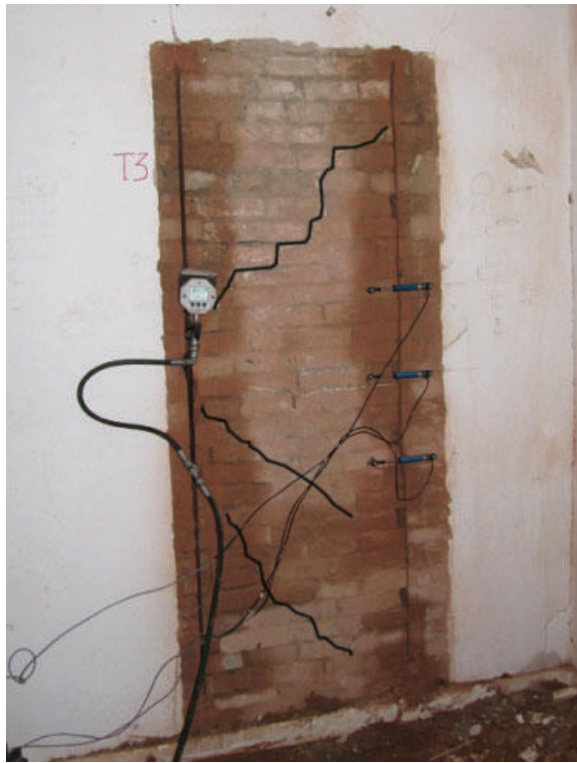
Masonry panel subjected to Flat Jack – Shear Compression Test: the typical diagonal cracks are underlined.
